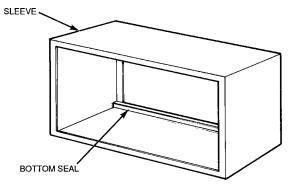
Remove Bottom Seal From GE Plastic Sleeve
